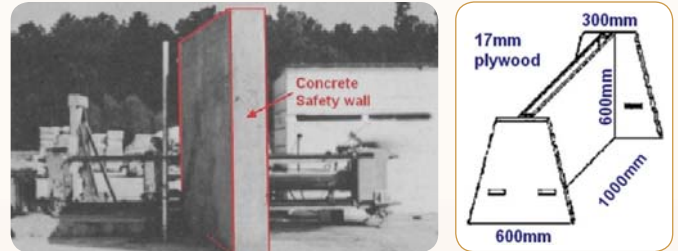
Safety baffles during prestressing. Left - concrete. Right - plywood.
